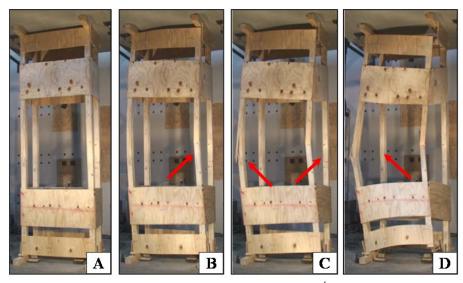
Progressive Failures A) 72kips B) 1st Failure C) Front Left and Back Right Posts Fail D) Back Left Post Fails (End of Test)
